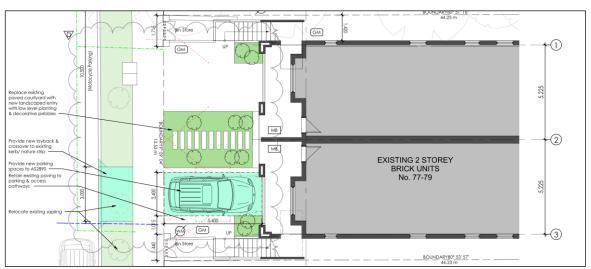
Proposed parking plan (source: Studio23design, dated 9/05/2025).
